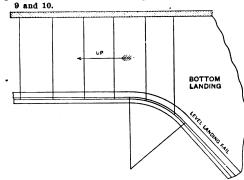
Plan of Stairway Having a Curve Less Than a Quadrant at the Bottom, the Wreath Connecting Both the Level Rail and the Rail of the Flight Adjoining. PLAN PLAN
